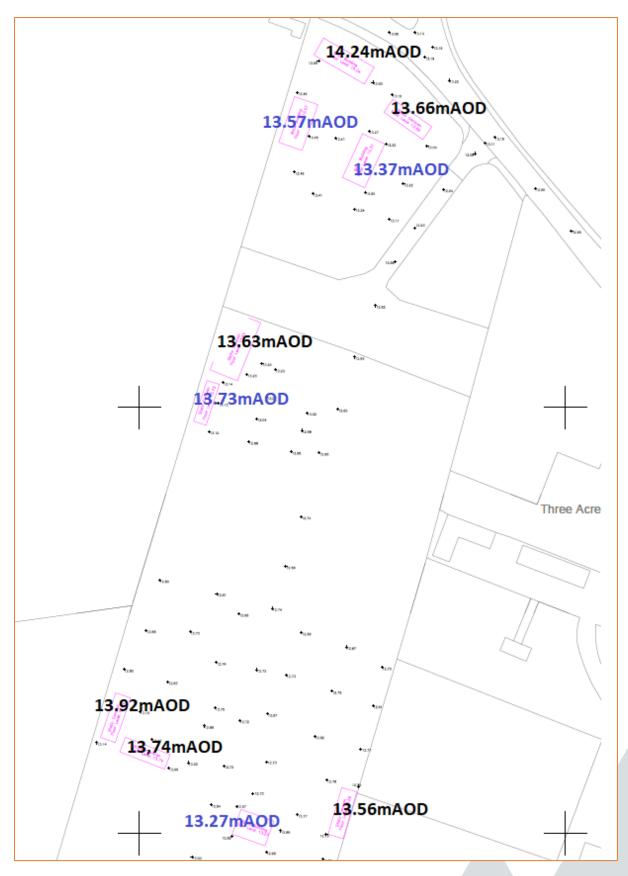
Extract from topographical site survey showing finished floor level of static caravans in black, and day rooms in blue (Source: SJM Surveys Ltd)
